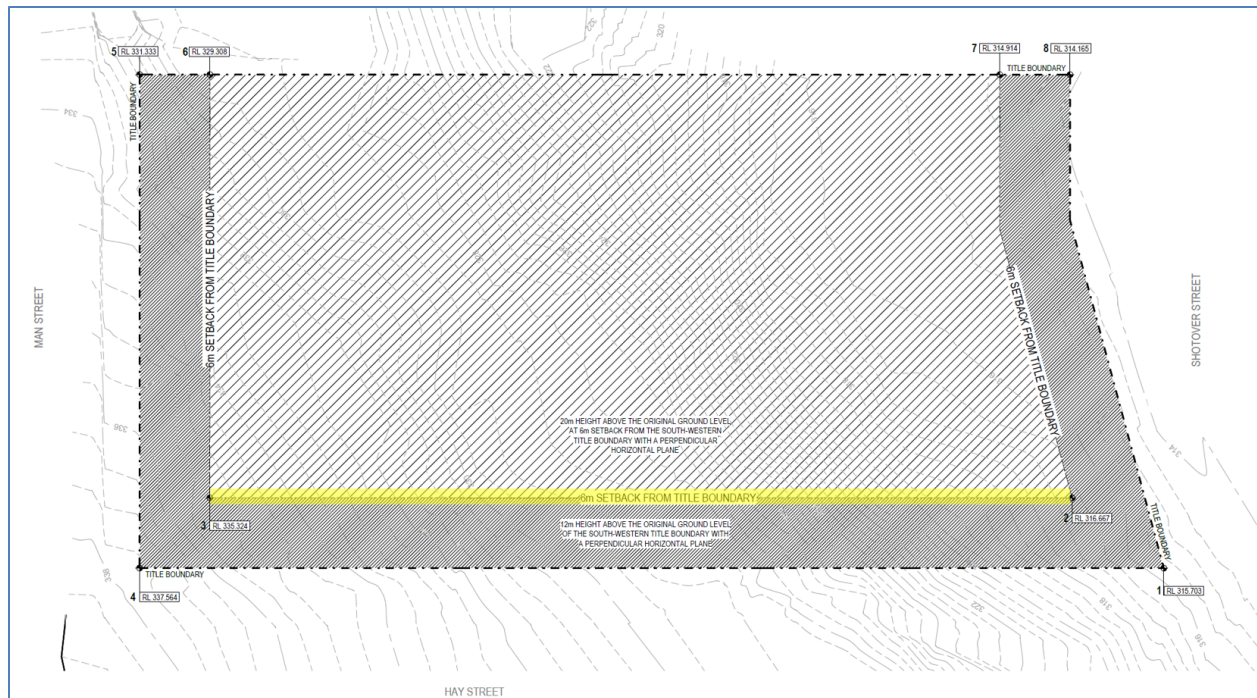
Contour / Site Plan showing extent of 6m setback where the 12 and 20m building standards would apply. The maximum building height would be 20m measured from the original ground level at a location 6m internal to the sites Hay Street Road boundary (the sites western boundary). This is indicated by the yellow line.
